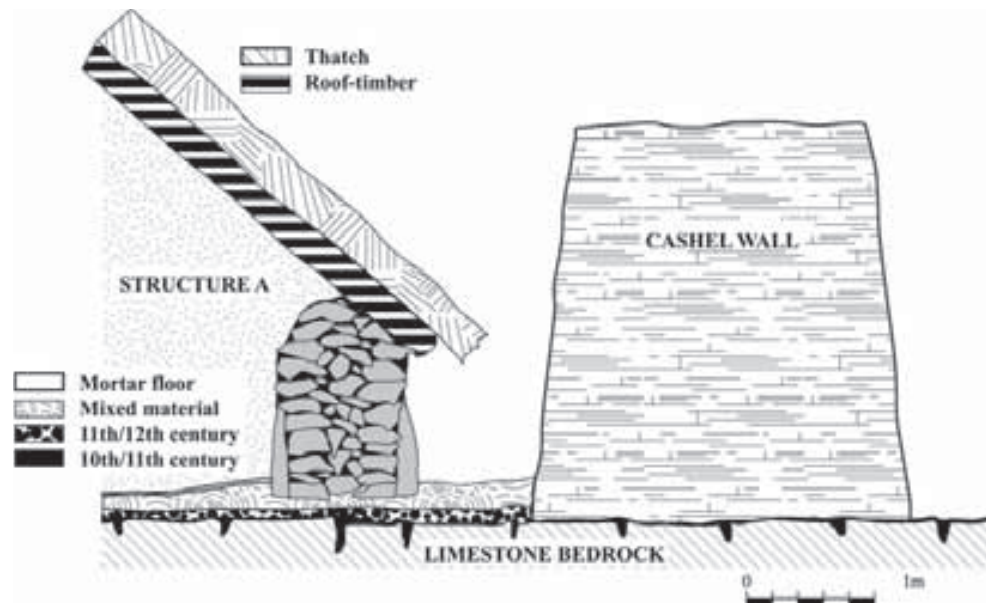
Conjectural reconstruction section of House A and cashel wall.
